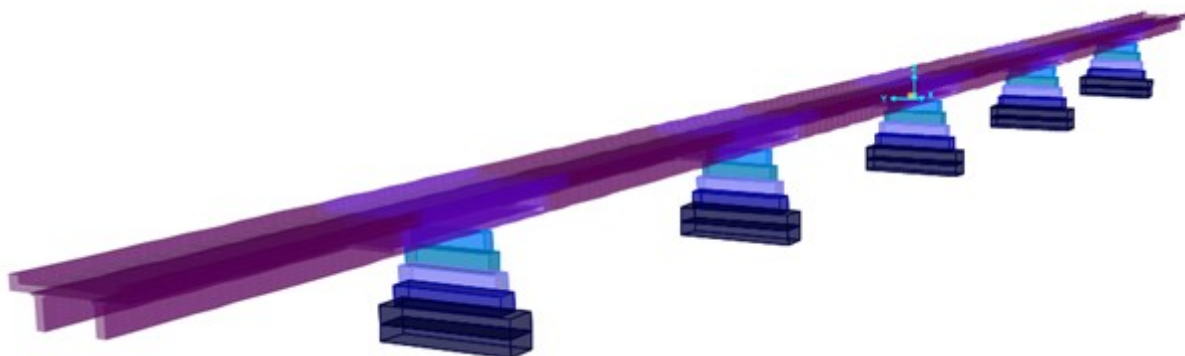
An extruded view of the deck sections and the pillar sections of the Beam-element model.
